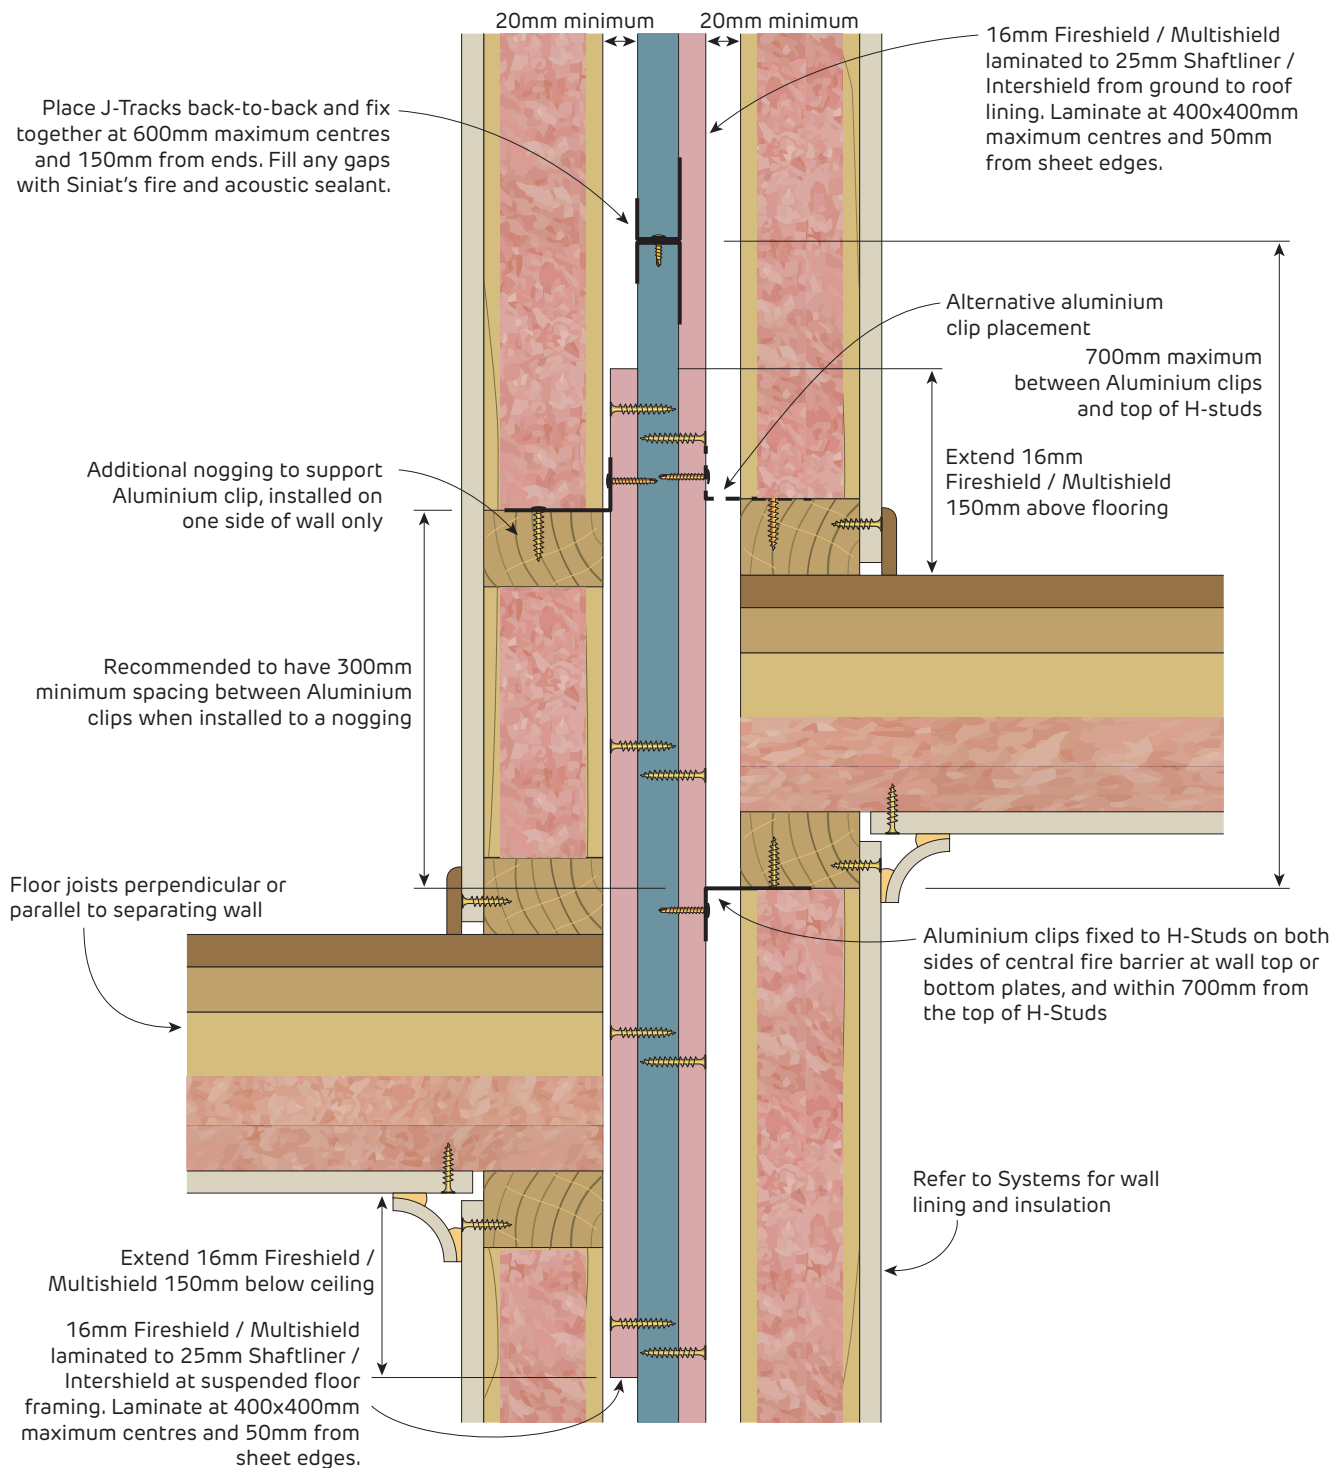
Interhome Wall to Upper Storey Staggered Floor with Additional Nogging Installed
